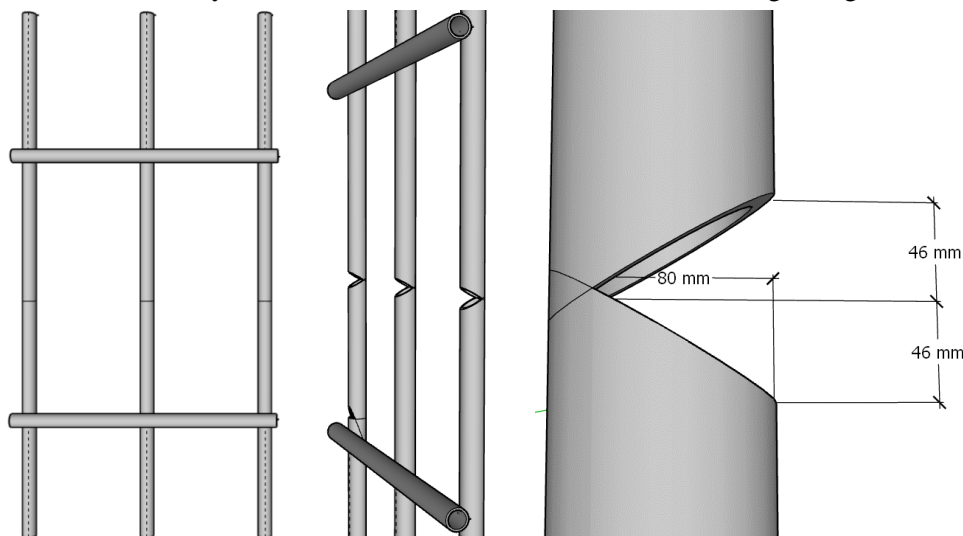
Dimensions of Opening 1 of the bamboo frame.
